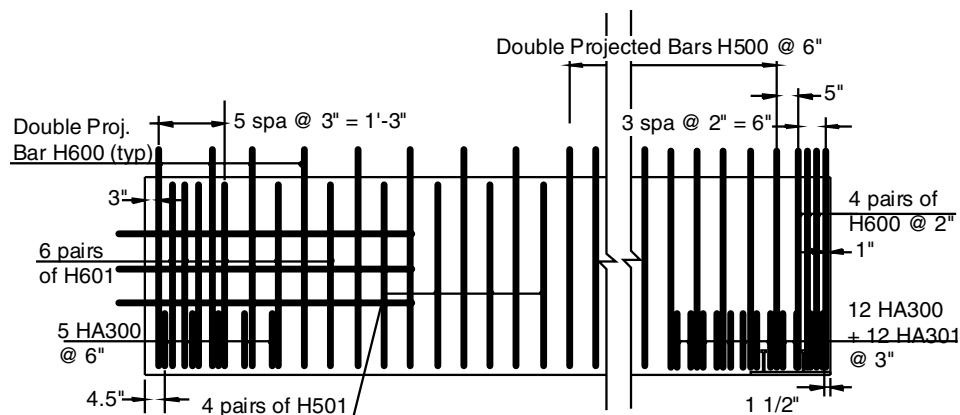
End zone reinforcement details of TN2L (TN) and TN2R (proposed).
